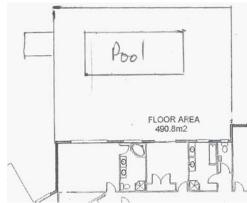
Site plan showing proposed pool and pool barrier, and existing house
